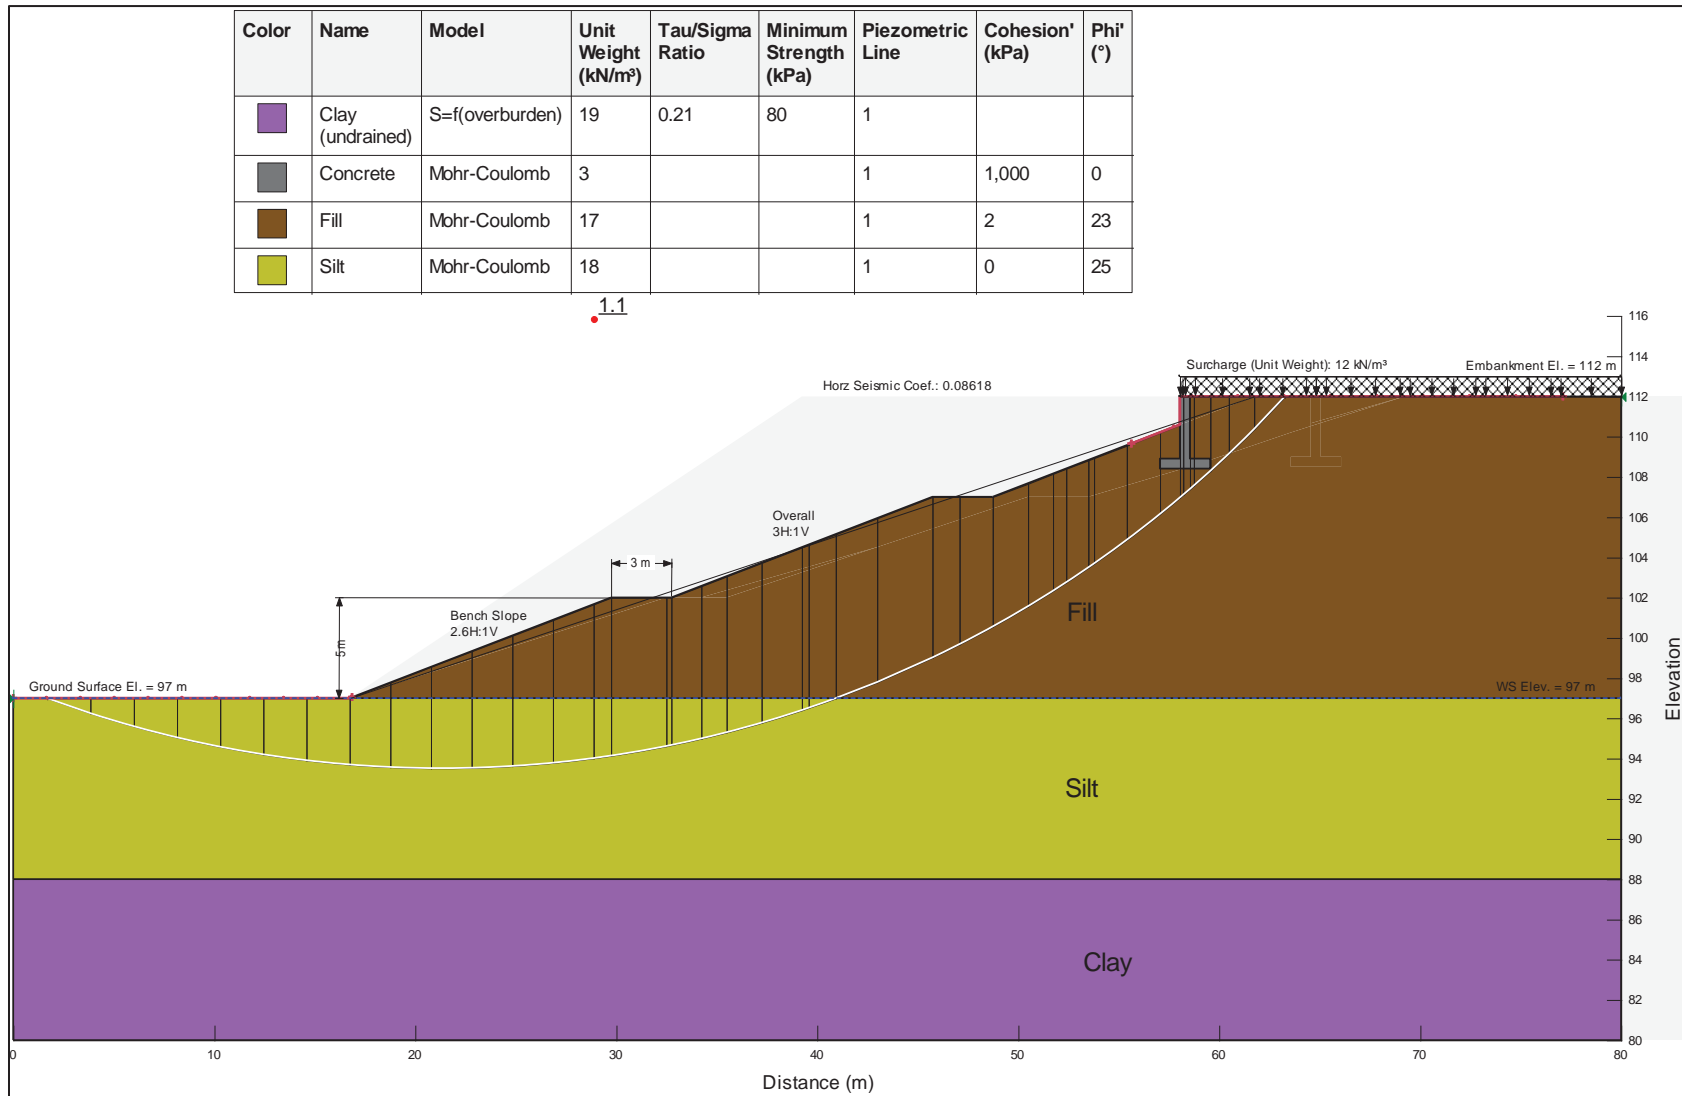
Jane St. South Embankment Pseudo-Static (Undrained) Case B2
